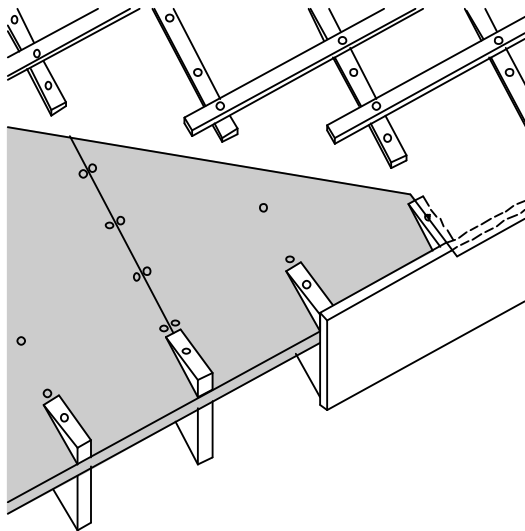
Typical pitched roof with sarking board and tiling underlay beneath the counter battens.
